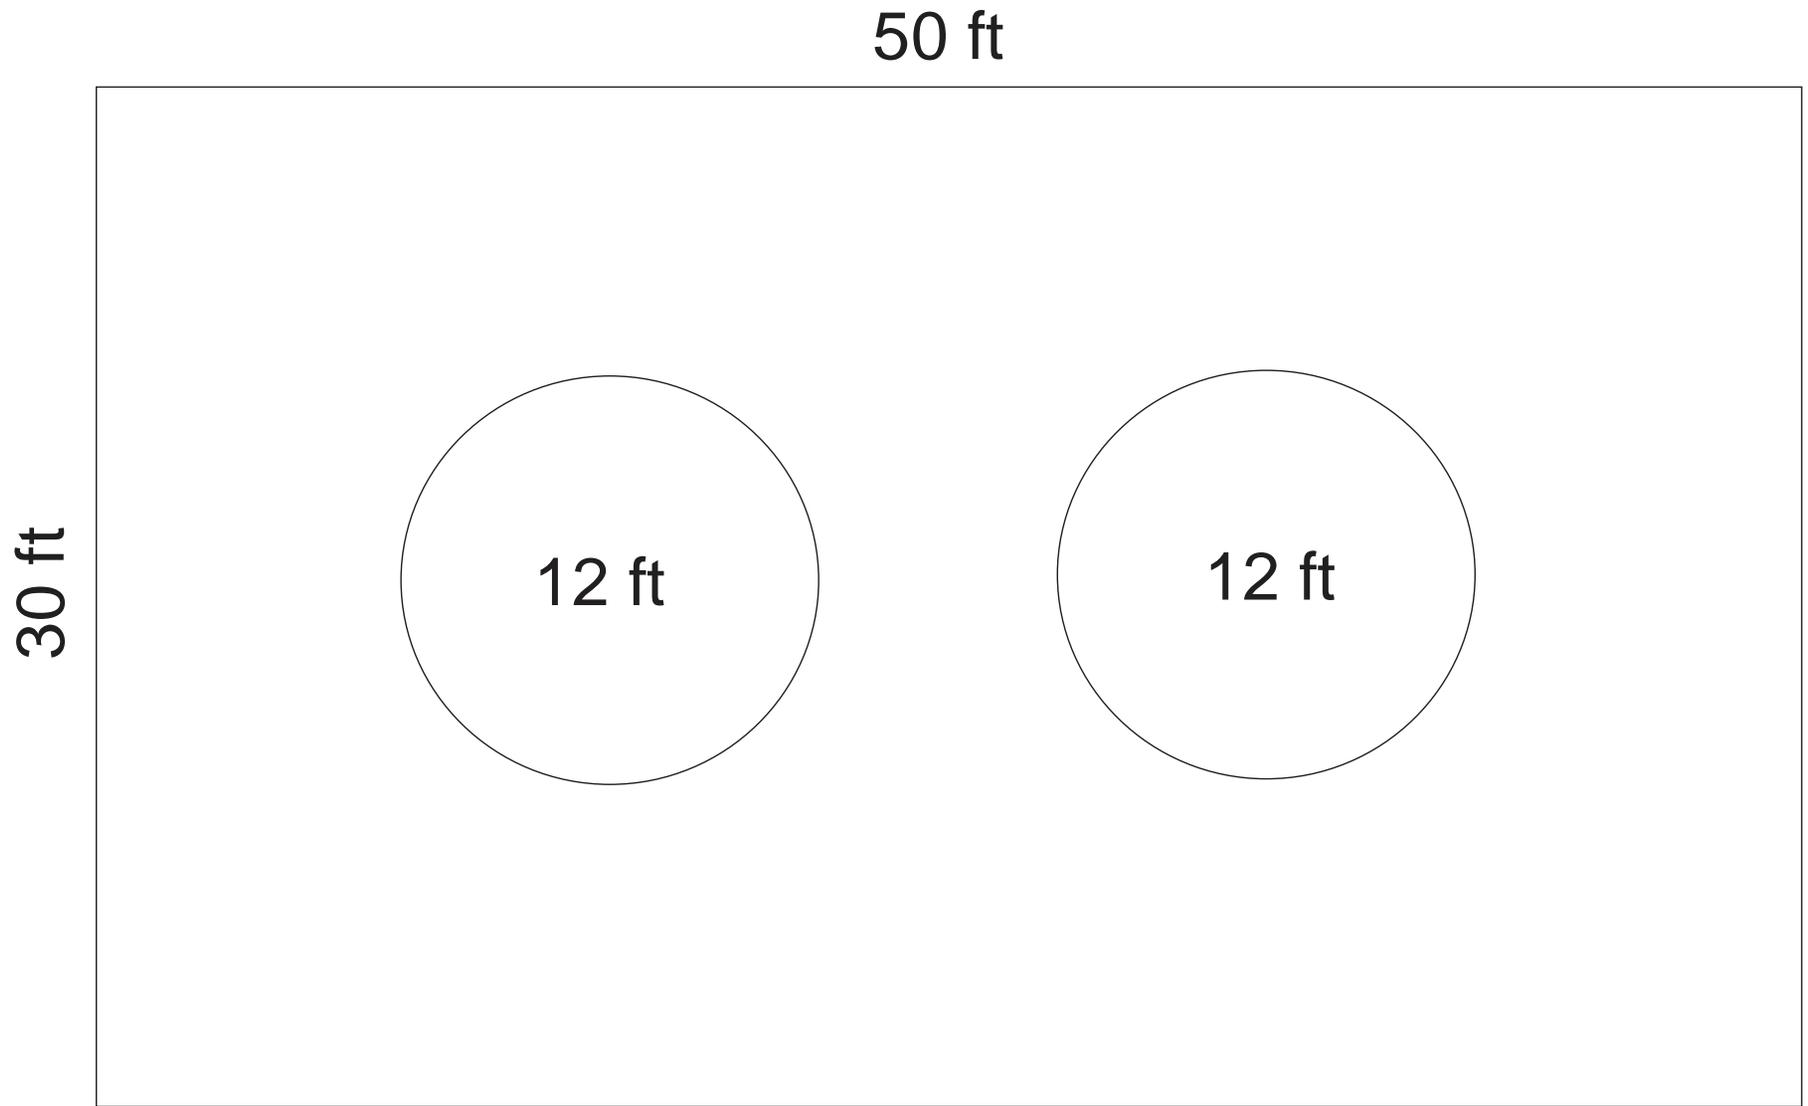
Sturgeon rearing building configuration at Walla Walla South Fork Hatchery.
